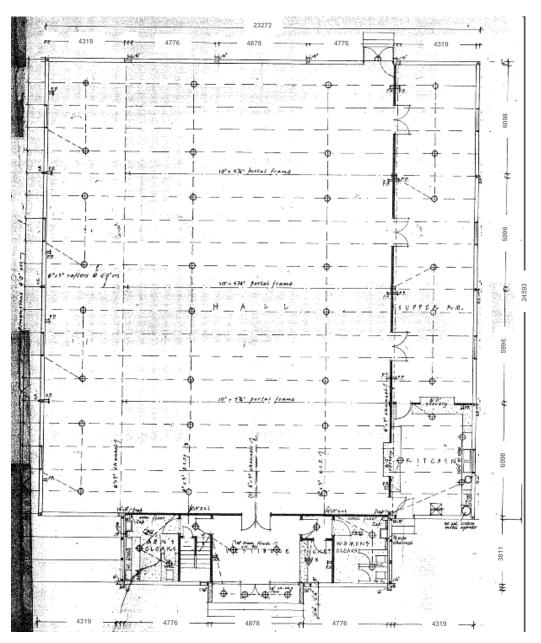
Plan Showing Roof and Mezzanine Floor Key Structural Elements
